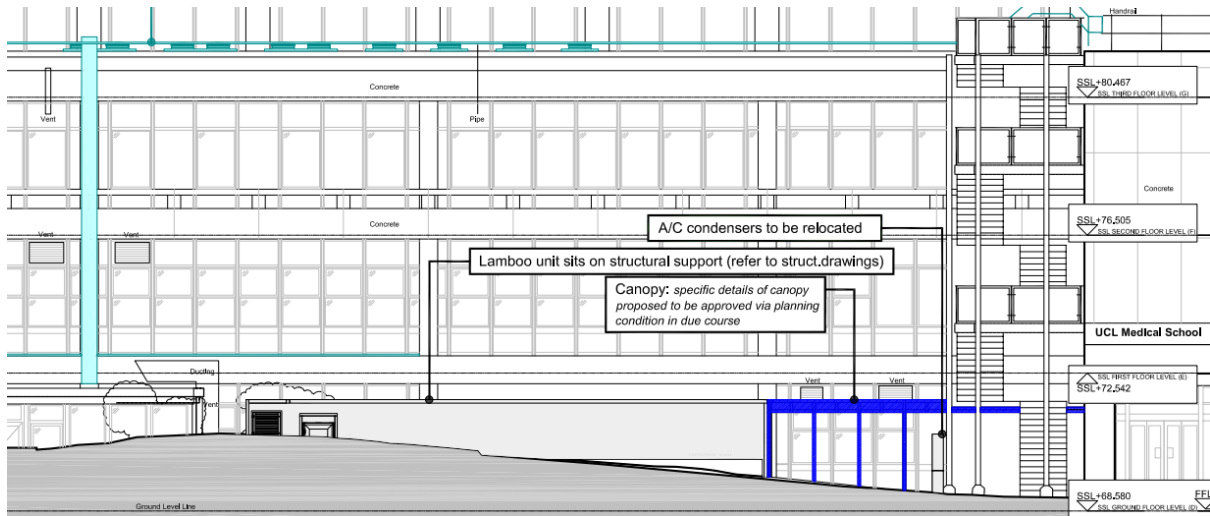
Main elevation of Lamboo unit & Canopy (South-West)
